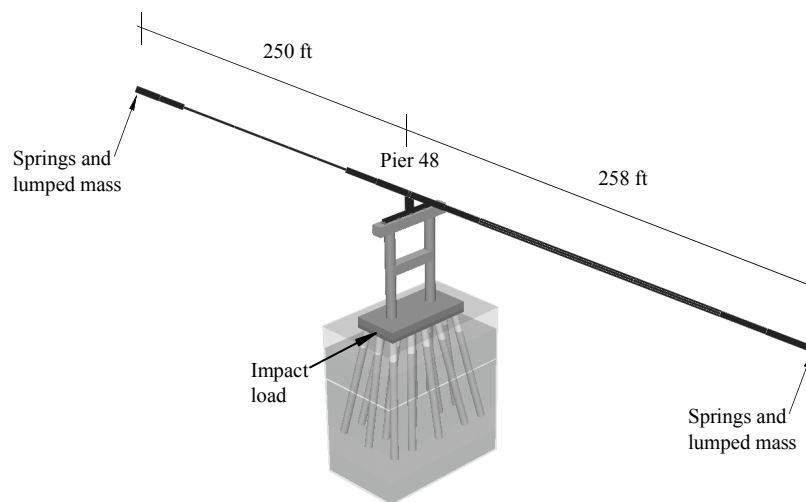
New St. George Island Bridge, Pier 48 (NSG-CHA) OPTS model
